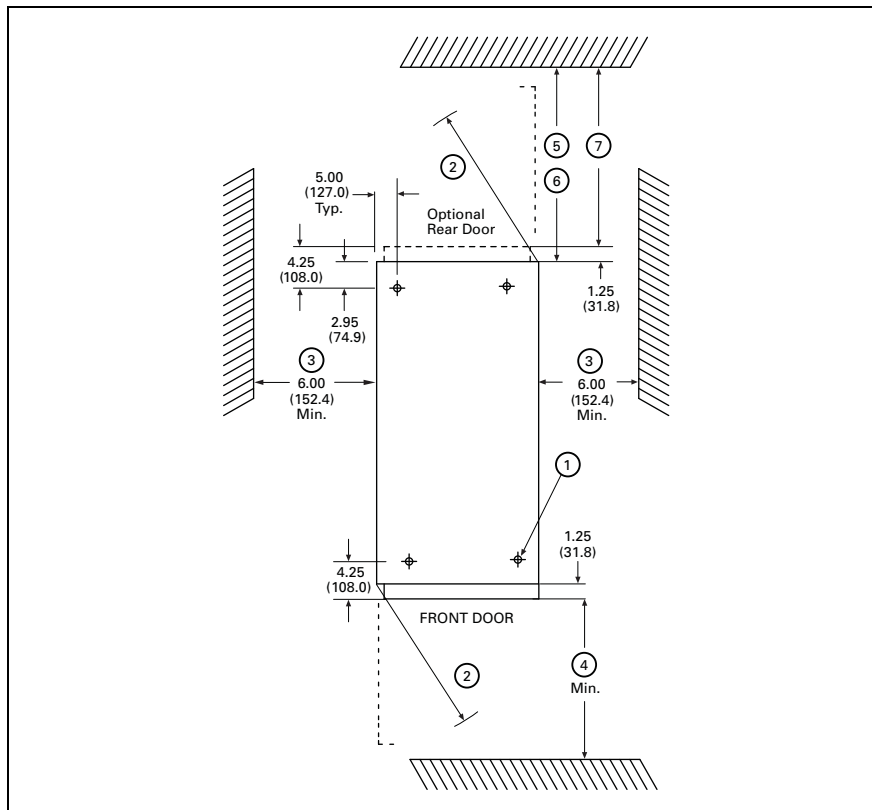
Typical Anchor Plan for MSB, Indoor or Outdoor
